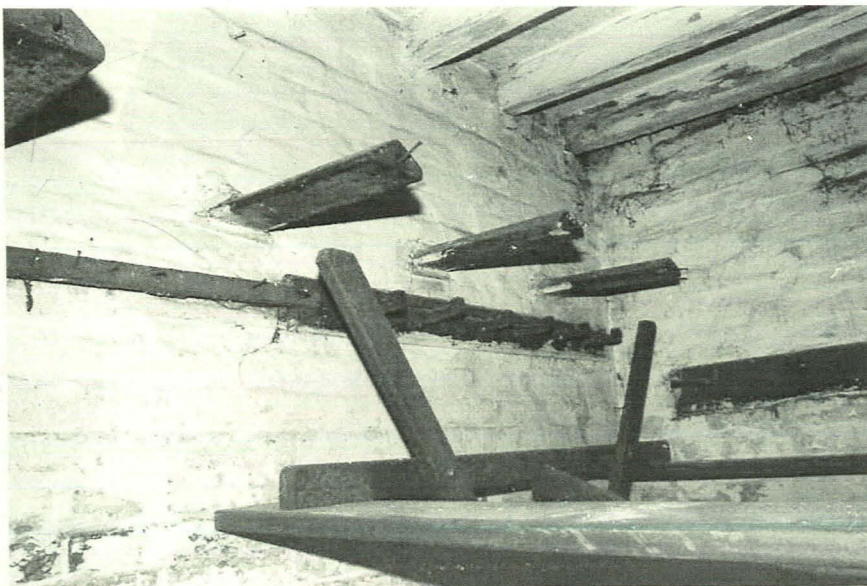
Projecting Posts and Hooks, Ground Floor, East End Store Room, North Wing, looking northeast
